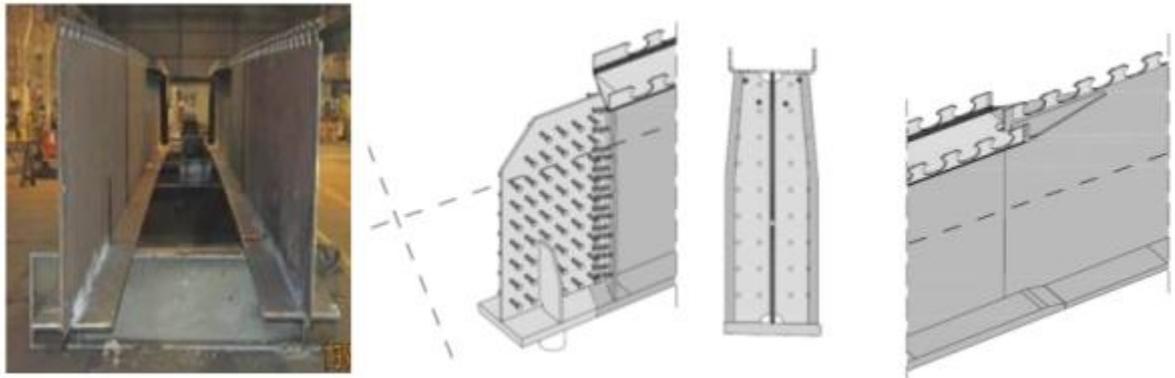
The steel girder type sections; the end steel girders detail and the transition detail between the two types of section.
